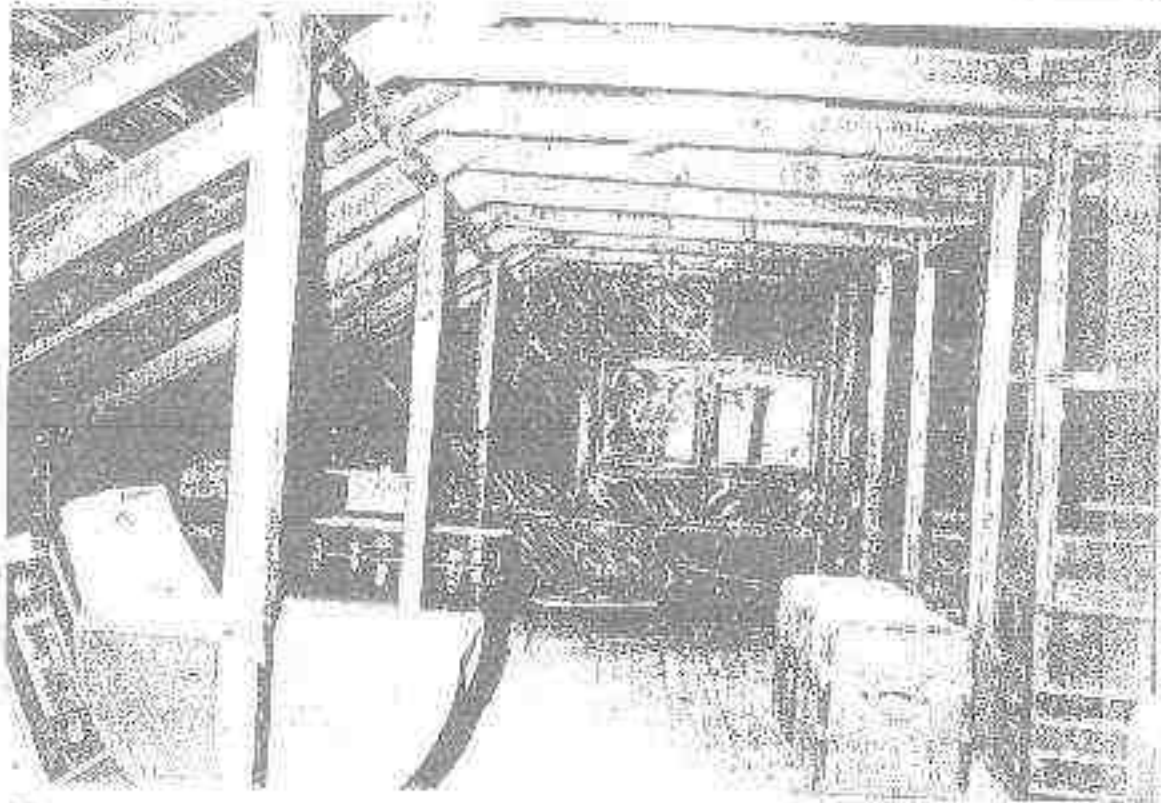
Interior of second floor of Carriage House looking north. No window openings have been seen.
